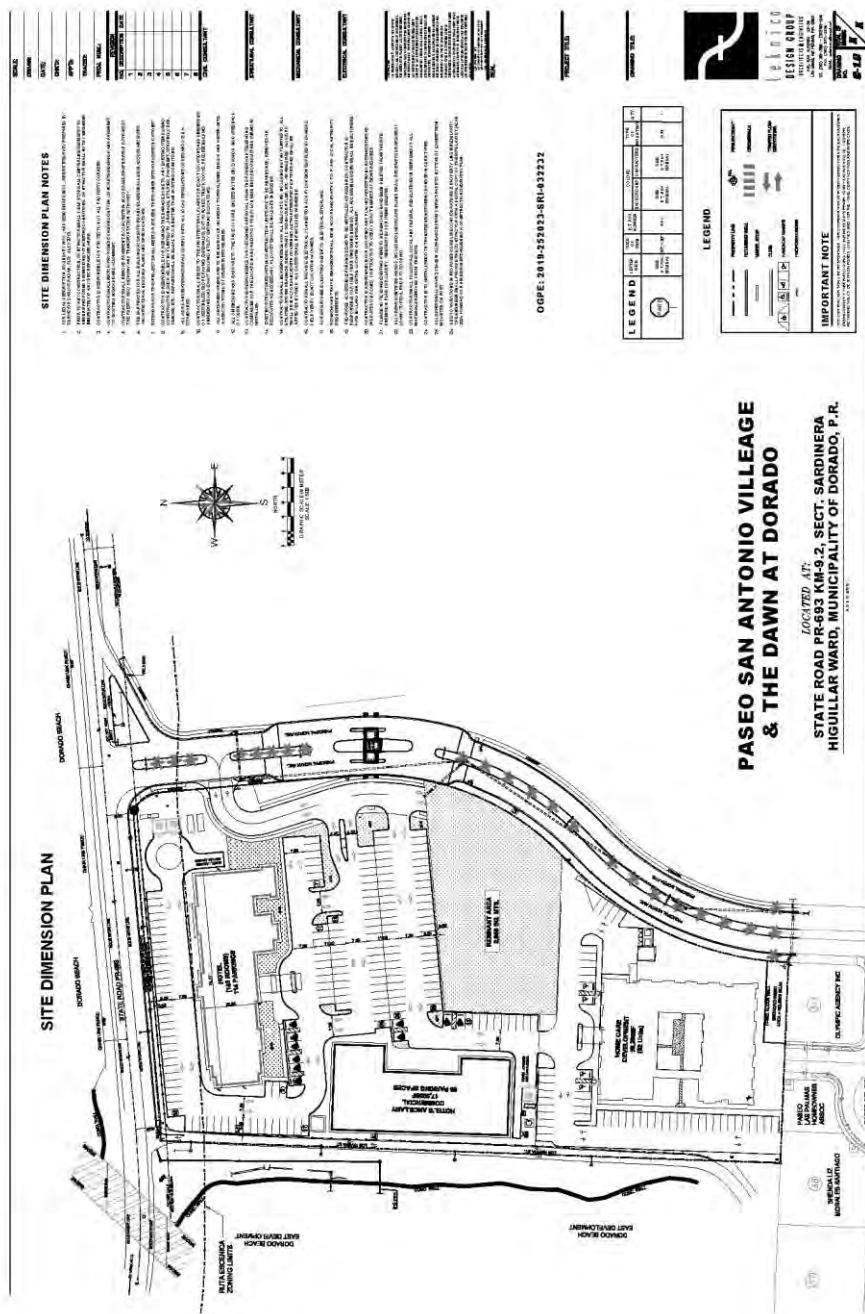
Proposed Development Site Plan (Source: Teknica Design Group).
